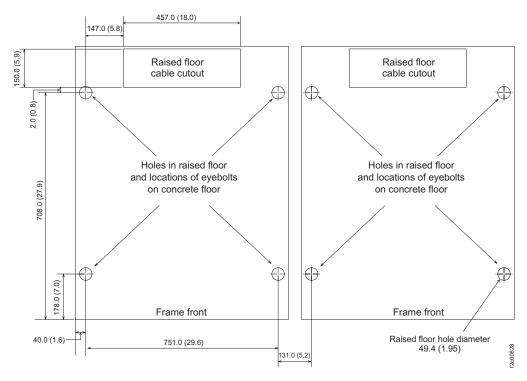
Locations for cable cutouts and rubber bushing holes for raised floor and eyebolt installation on concrete floor
